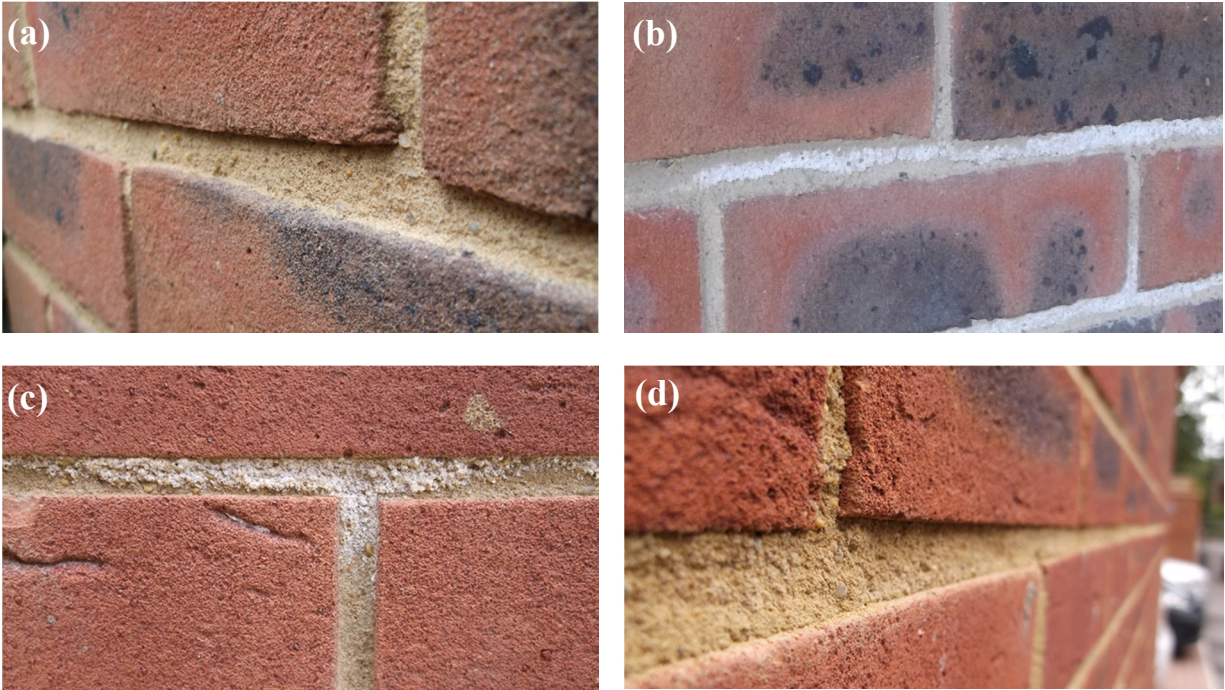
Mortar erosion and mortar joint efflorescence as seen during the inspection of the brickwork at Site B. (a)-(b) ‘Red Multi Stock’ Brick Type 1, (c)-(d) ‘Red Extruded’ Brick Type 2. (a) typical erosion of the mortar joint surface, (b) (c) typical mortar joint efflorescence, (d) mortar joint erosion associated with the Red Extruded, Brick Type 2.
